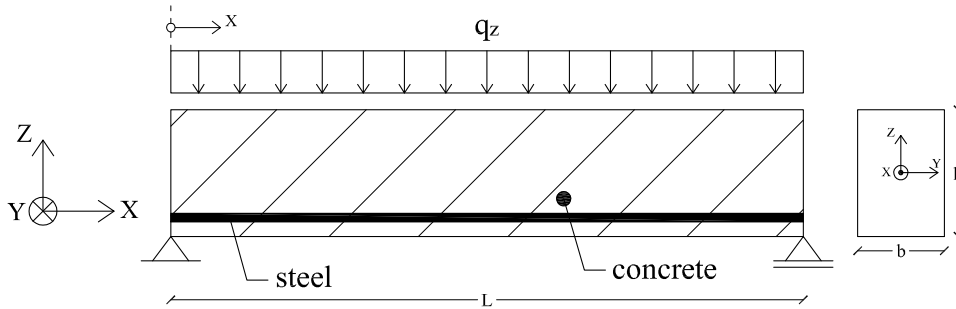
Example of a simply supported reinforced concrete beam
